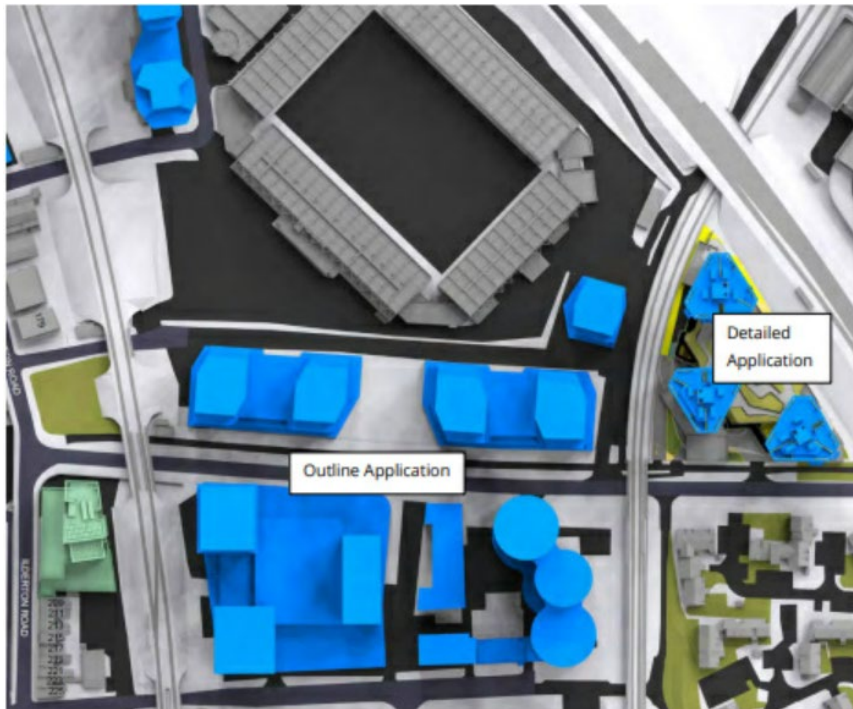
Image: Context of 227-255 Ilderton Road (outlined in blue) to subject site (green)
